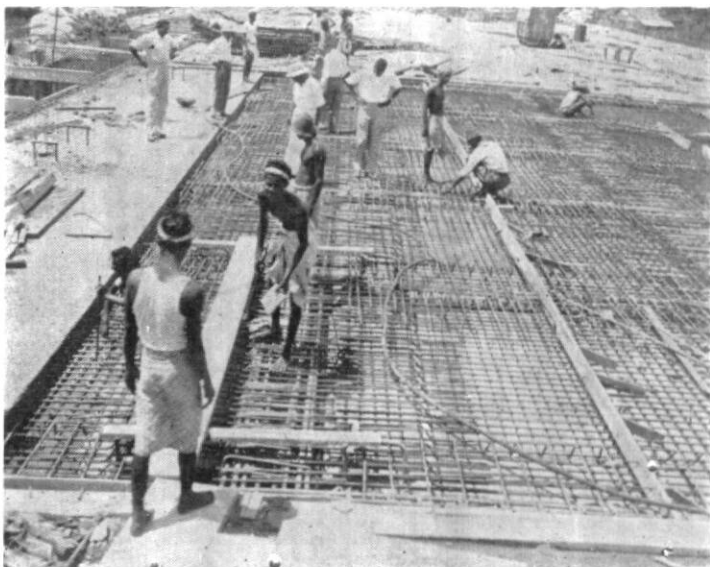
Fig. XIII. Finishing touches to assembling of reinforcement in roadway slab.
